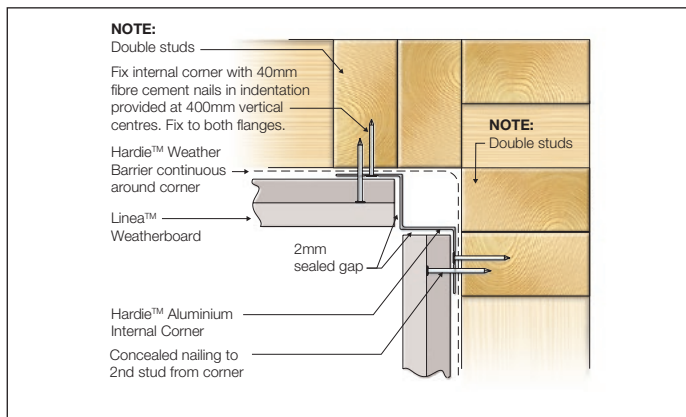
INTERNAL CORNER MOULD DETAIL
